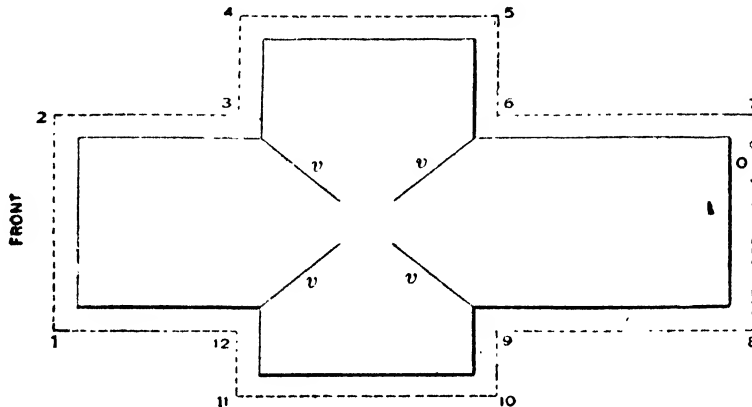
Roof with Single Leader Pipe. Plan of Roof.
